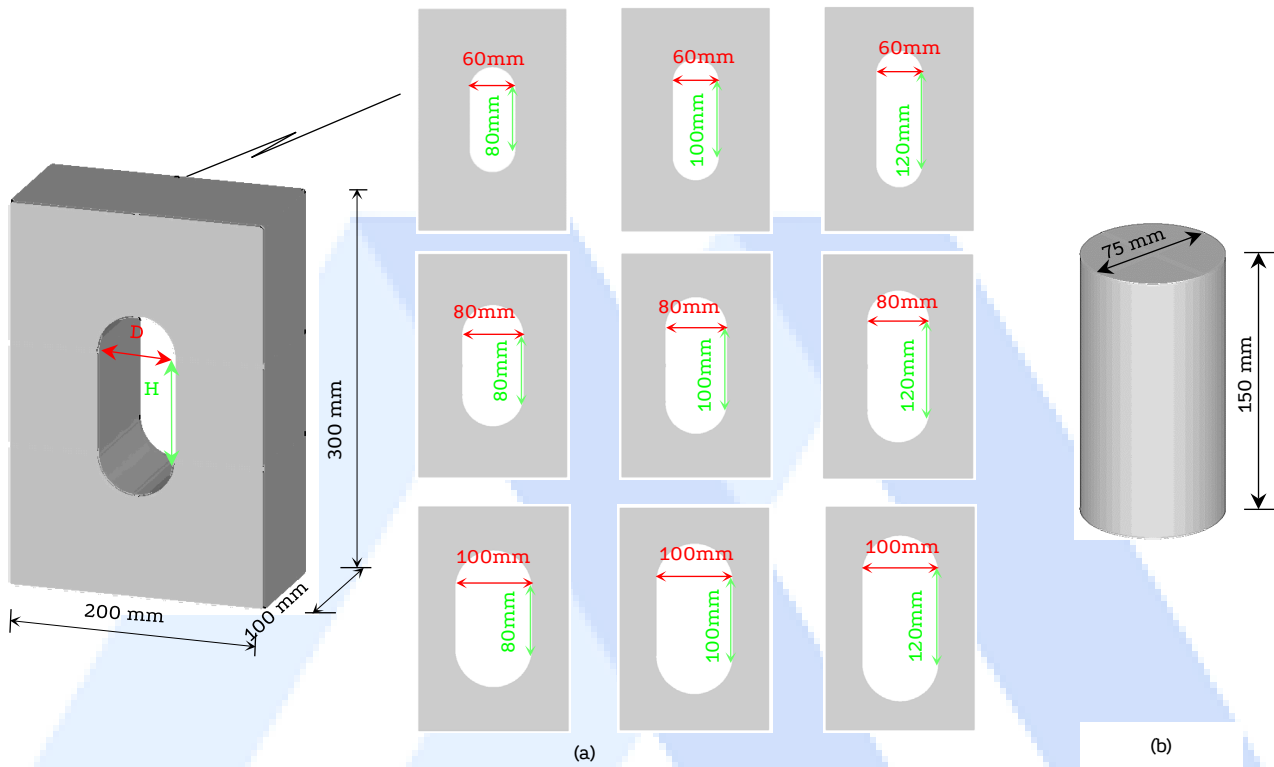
Considered dimensions of the (a) proposed HBT specimen and DTT specimen
